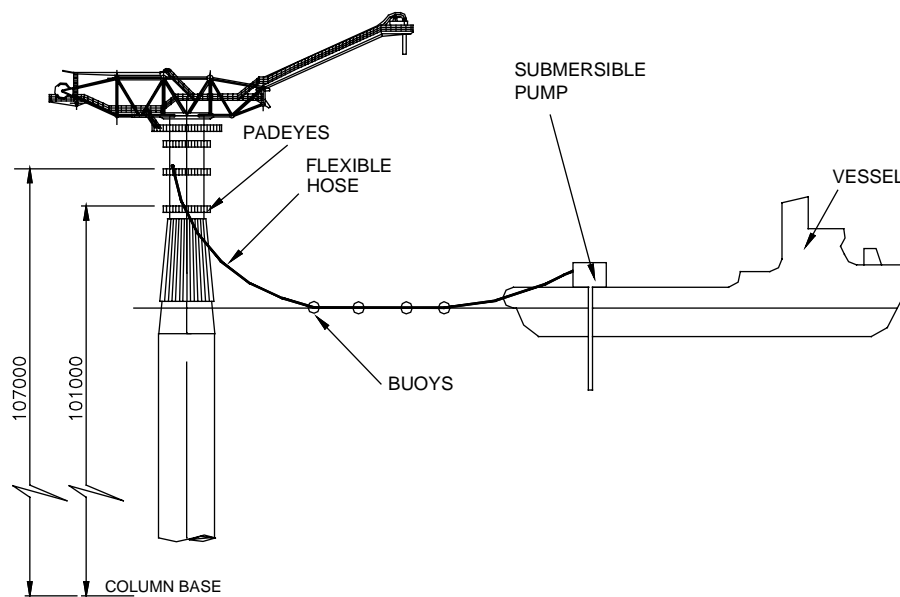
shows the column ballasting arrangement. The ballast water into the column will be supplied from submersible pumps on the vessel via a flexible hose connected to the original column ballast pipework.
